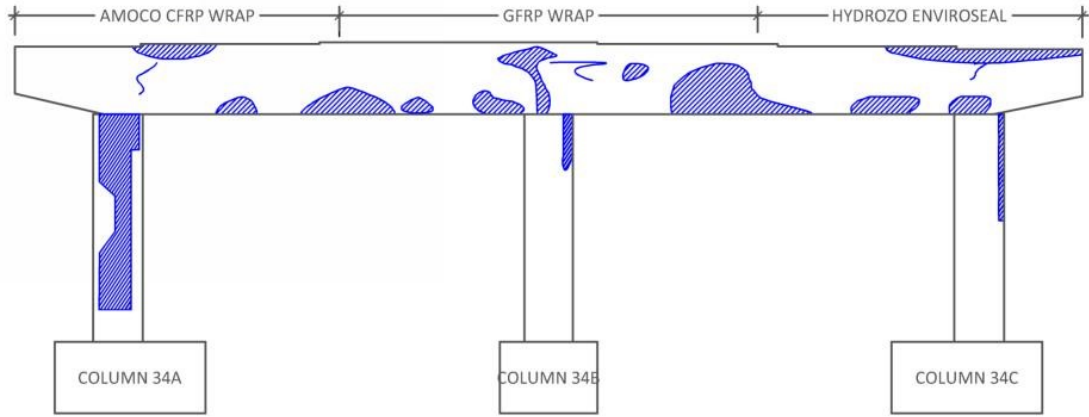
Example concrete repairs performed in 1997 (west face of Pier 40WB shown)
